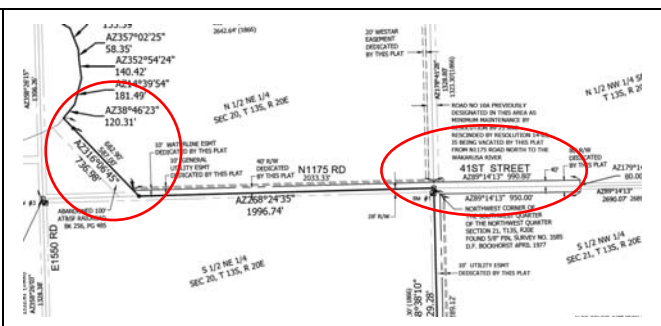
Final Plat detail without the vacated railroad right-of-way and with the additional right-of-way for the extension of E 1175 (41st Street).
